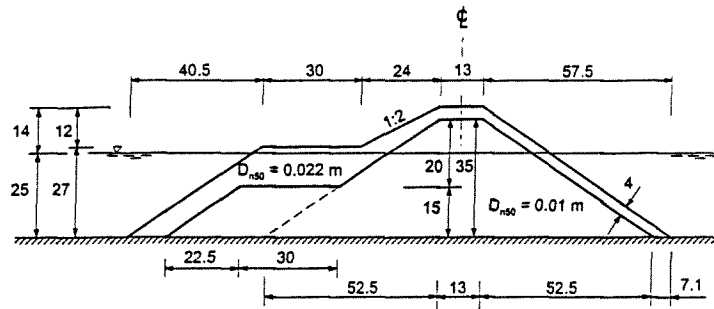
Breakwater cross-sections used in the 3D tests at SINTEF.
